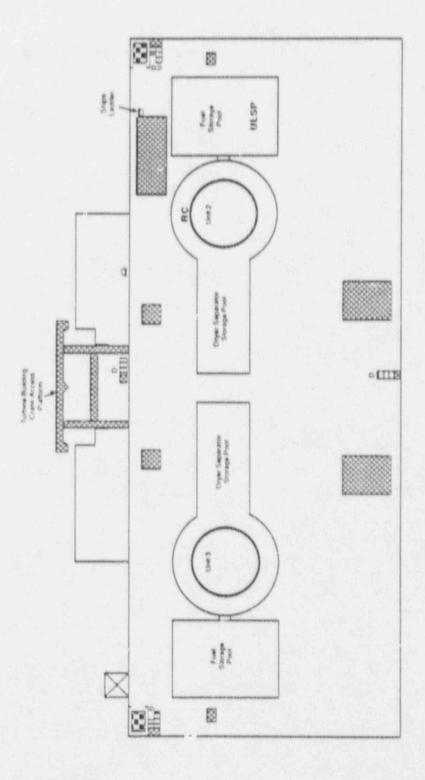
Dresden Units 2 and 3 Reactor Buildings, Elevation 613'-0"
